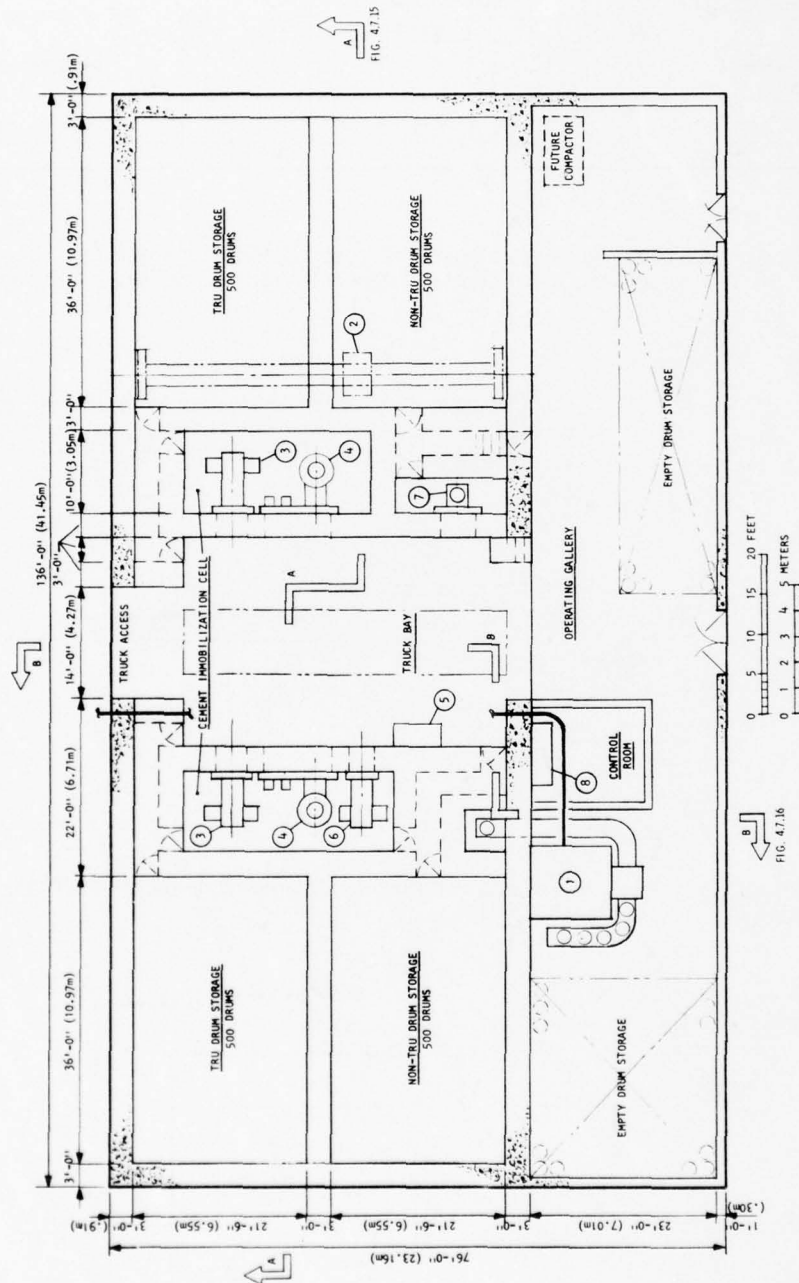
Fuel Reprocessing Plant Cement Immobilization Facility Plan
